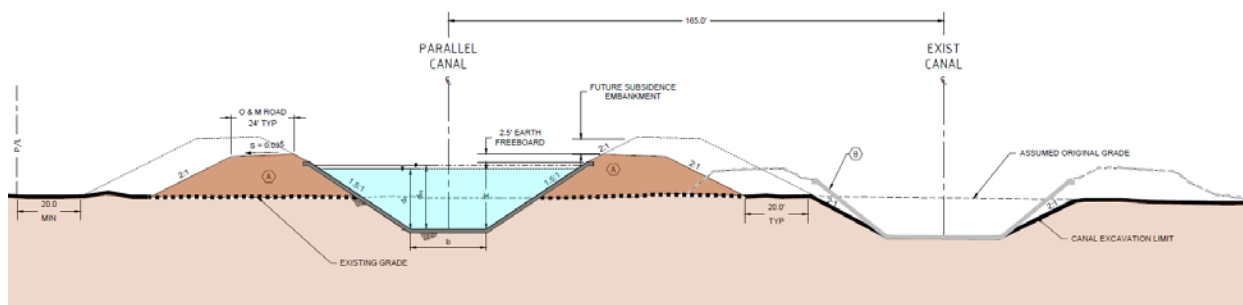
Trapezoidal Cross Section of Realigned Canal Segments in the Recommended Plan
